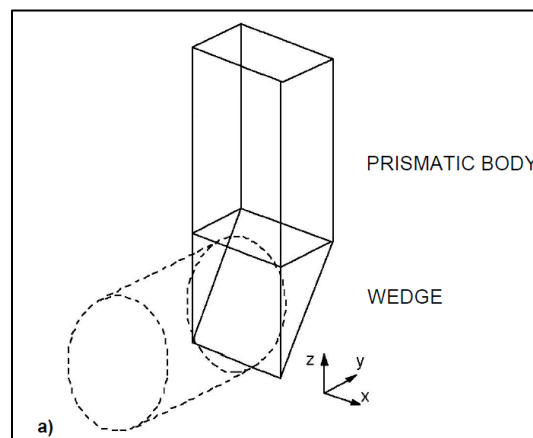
The Failure mechanism consists of a wedge and a prismatic body
